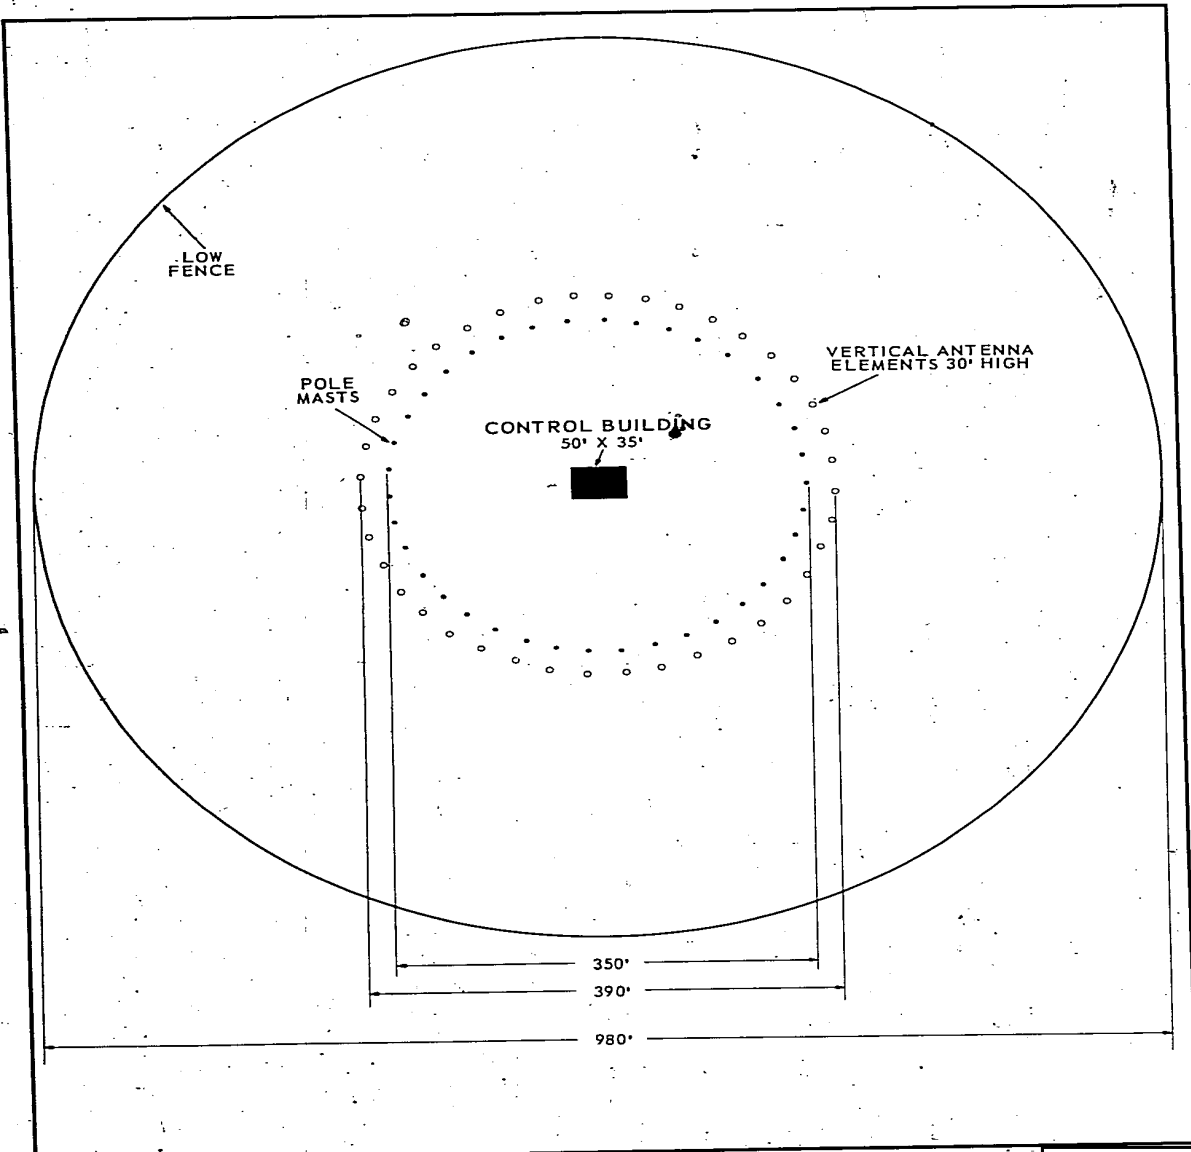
DIMENSIONAL DRAWING OF A TYPICAL KRUG INSTALLATION.
